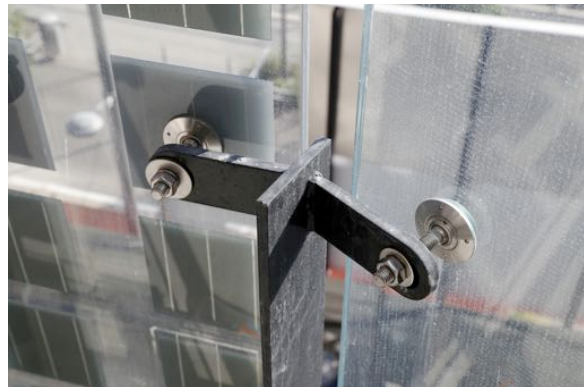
Support structure and bolts of the PV façade (September 2014)
